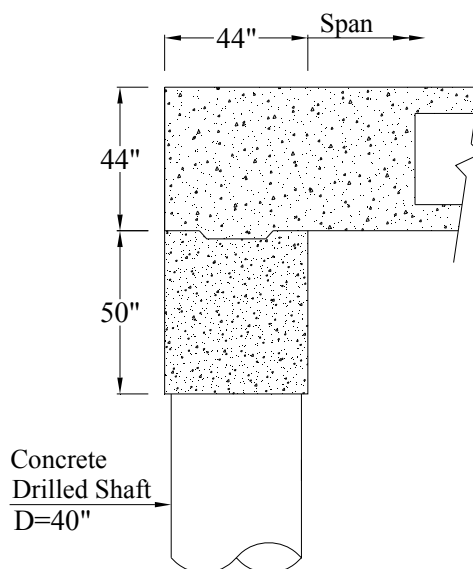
A Typical Integral Connection for Voided Slab Bridges
